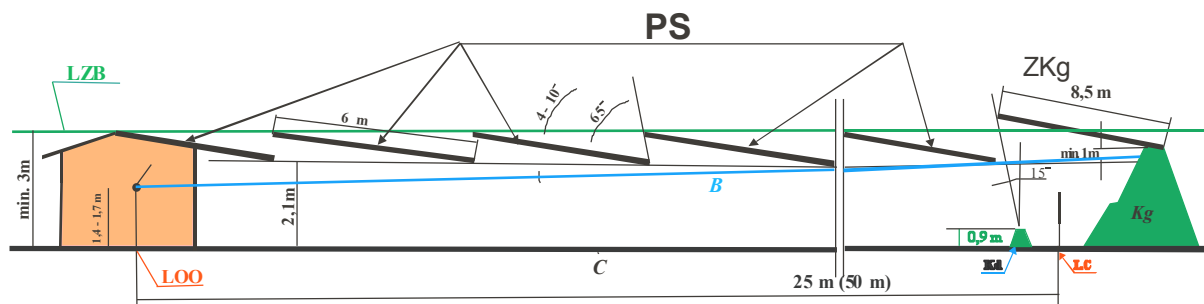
An outline of upper firing zone protection for pistol shooting range:
